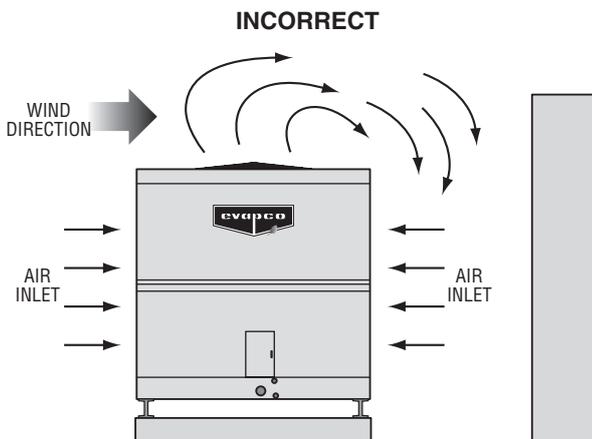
Installation with Top of Unit Lower than Top of Wall
